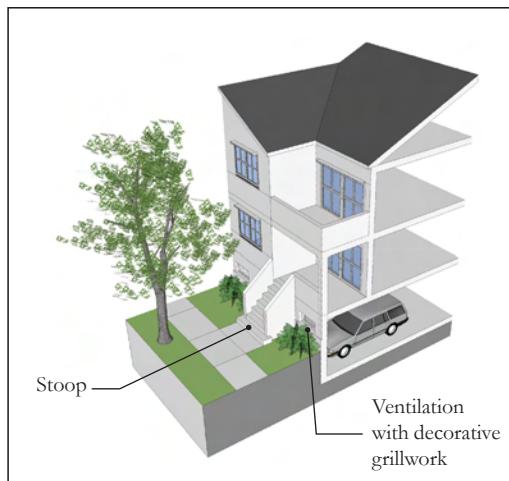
Semi-depressed parking should be screened with architectural elements that enhance the streetscape such as stoops, porches, or balcony overhangs.
